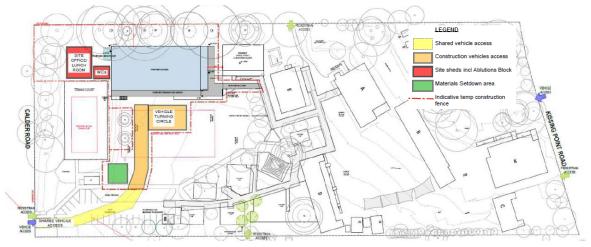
Proposed Work Zone (Source: Fulton Trotter Architects, Proposed Site Plan (Rev P5))
